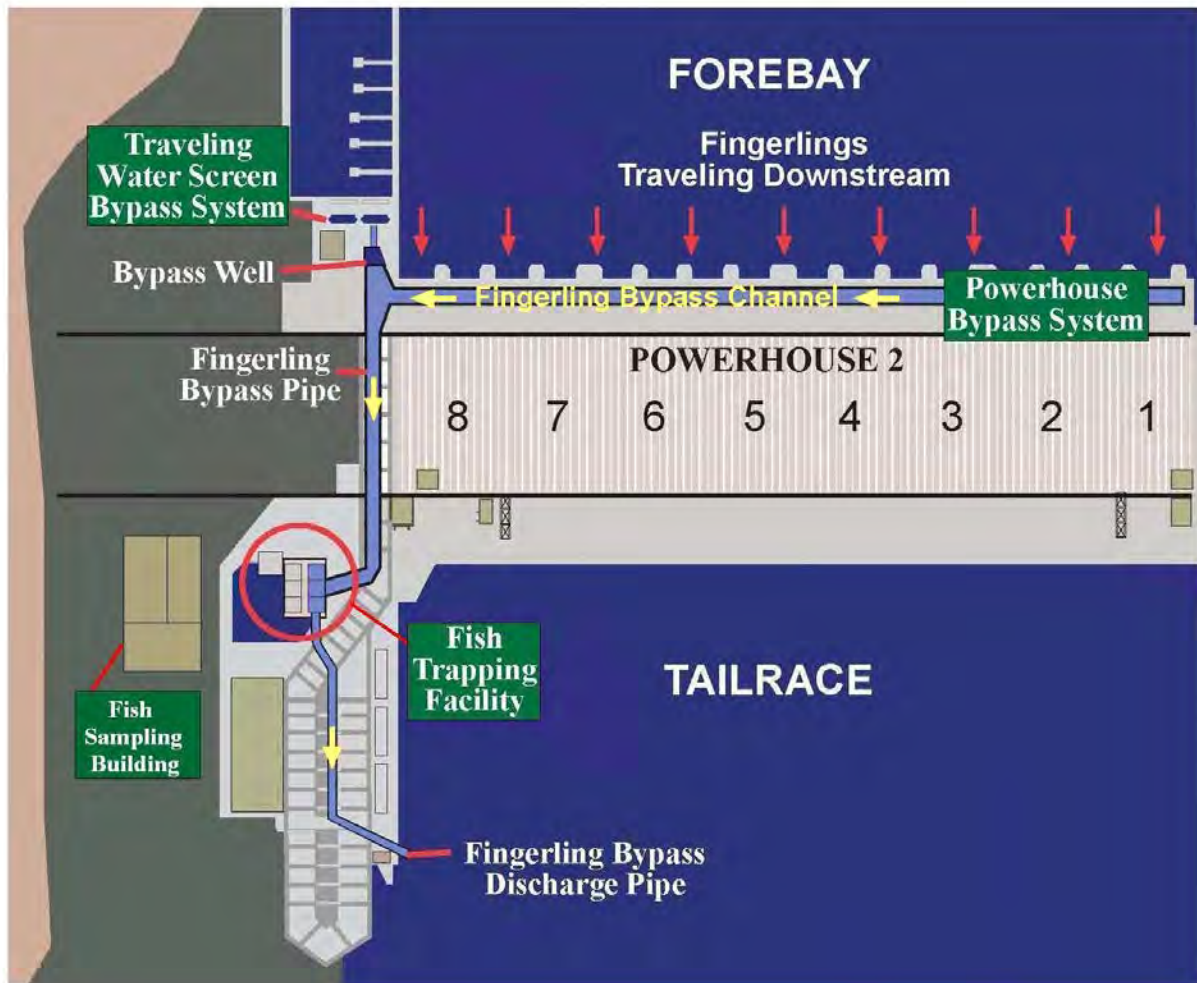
Plan view of Rock Island Dam Powerhouse # 2 Juvenile Bypass and Collection System
